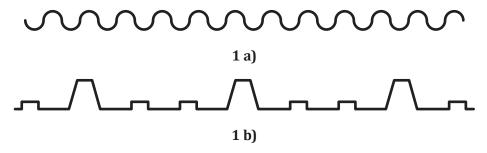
Illustration of typical profiled sheet (see 1.3.6)
